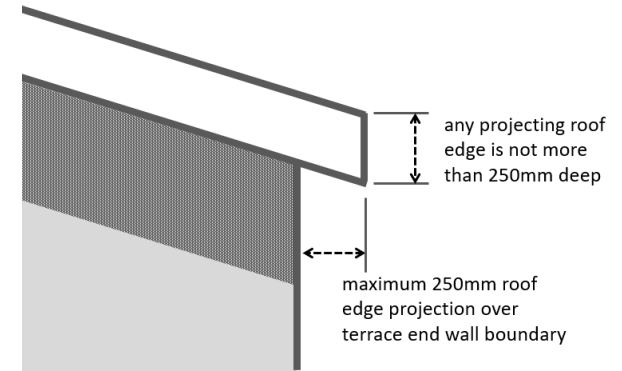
Diagrammatic elevation illustrating maximum projection at a terrace end wall, and the maximum depth of any projecting roof edge
